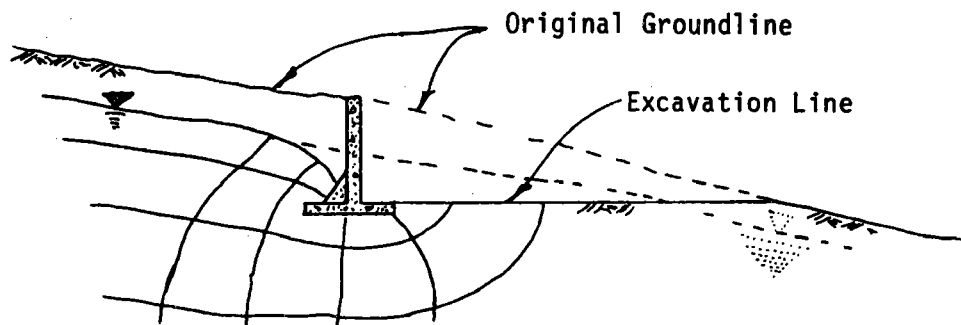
POSSIBLE INSTABILITY DUE TO EXCAVATION BEYOND TOE OF
